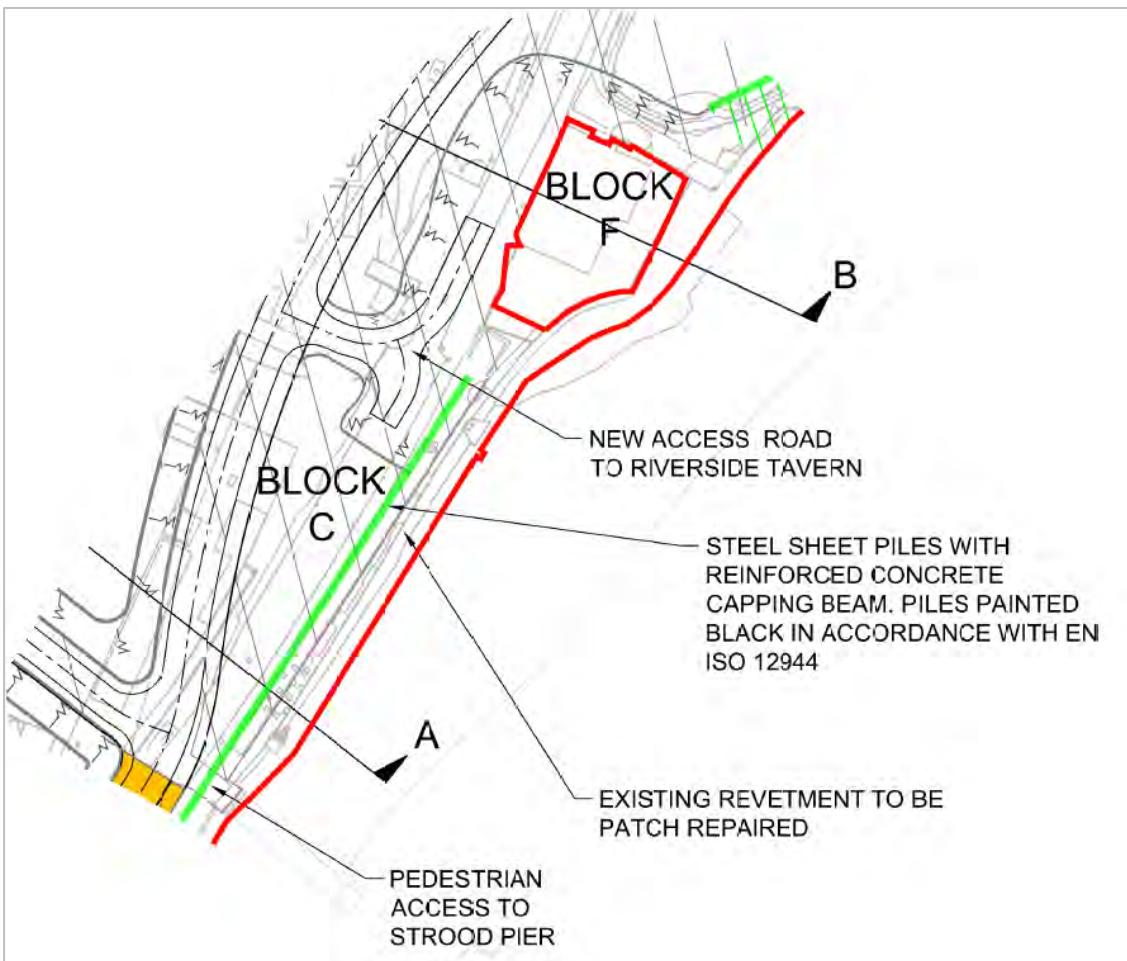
Clip of general arrangement between Strood Pier and Riverside Tavern on the Phase 2 site
